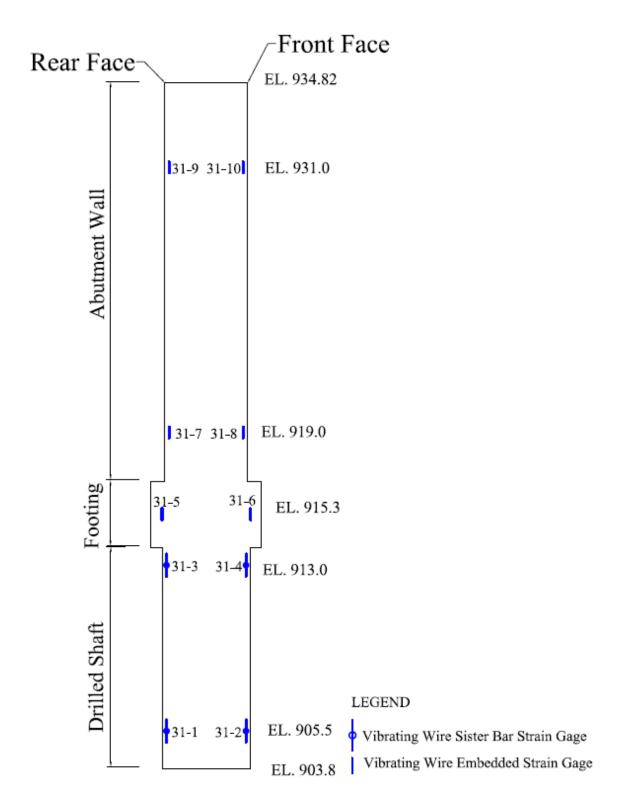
Gage locations in Drilled Shaft 29, footing, and abutment wall (EL in ft: 1 ft = 0.305 m).
